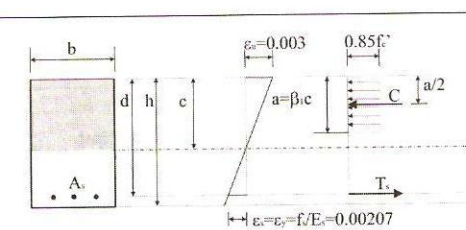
Distribution of strains and stresses in the cross-section of single reinforced ordinary concrete beam.
